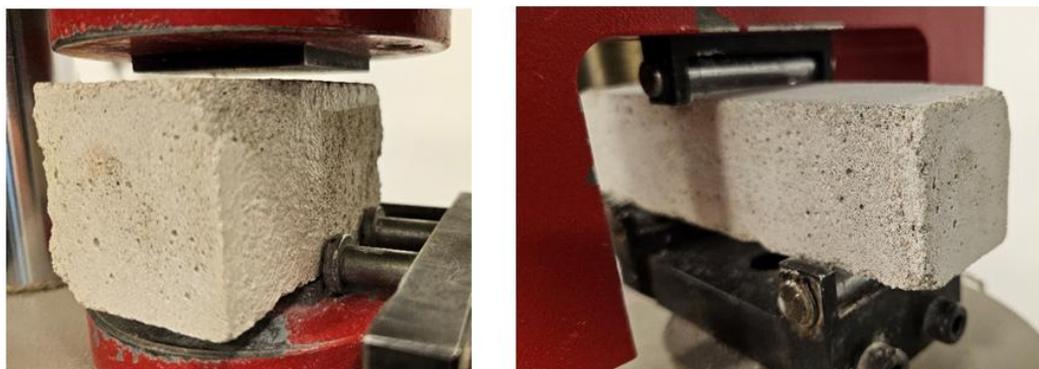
Mortar specimens: a) compressive test, b) bending test
